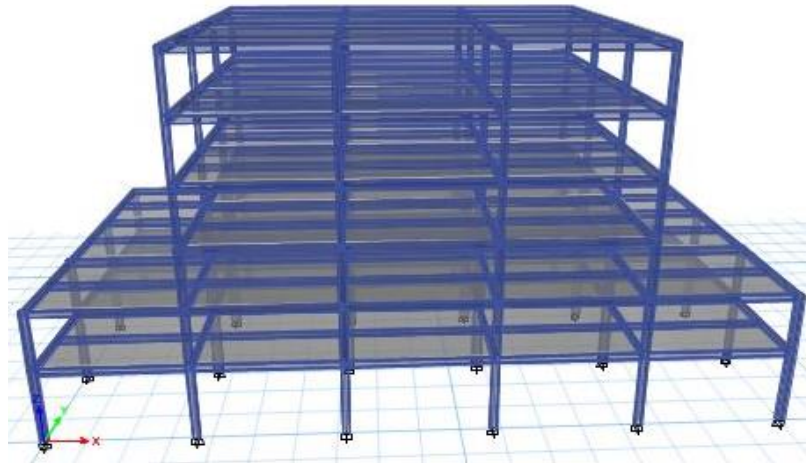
3D view of (1Rx1L) 6 story elevation
